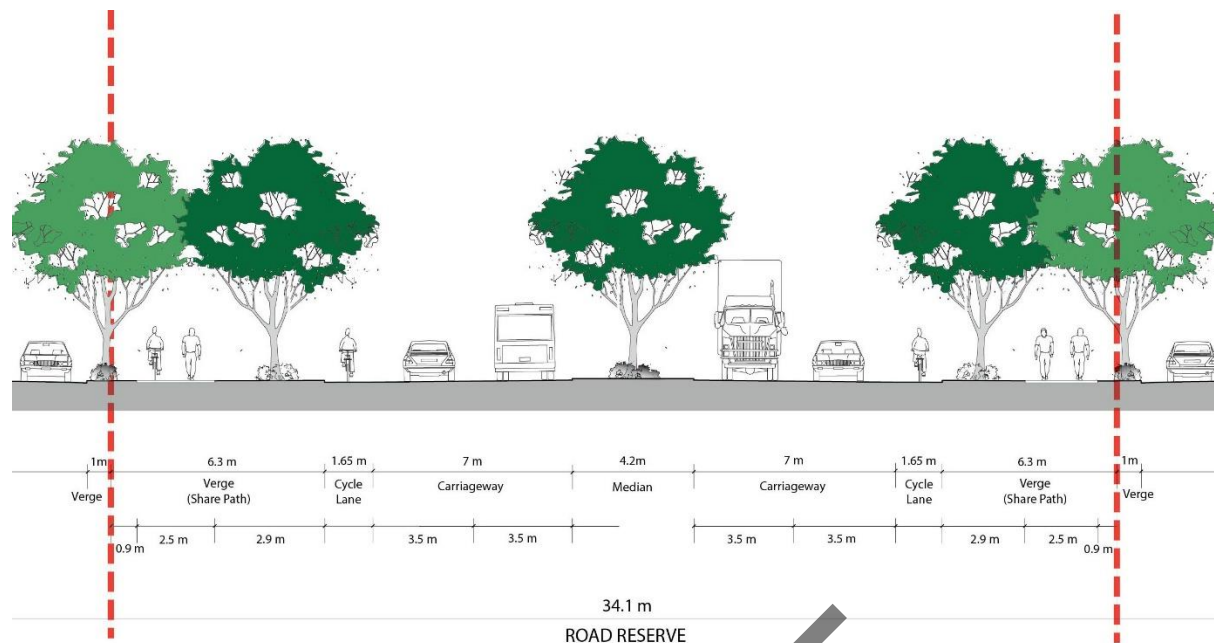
Sub-Arterial Road Cross Section (On-Road Cycle Lane)
